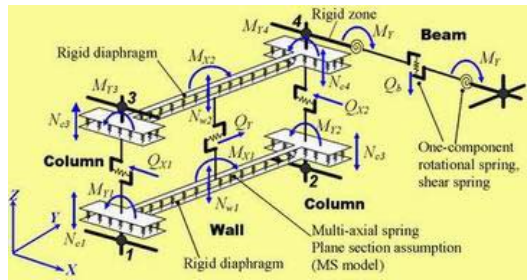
Idealization of beam, column and shear-wall for 3-D frame model
